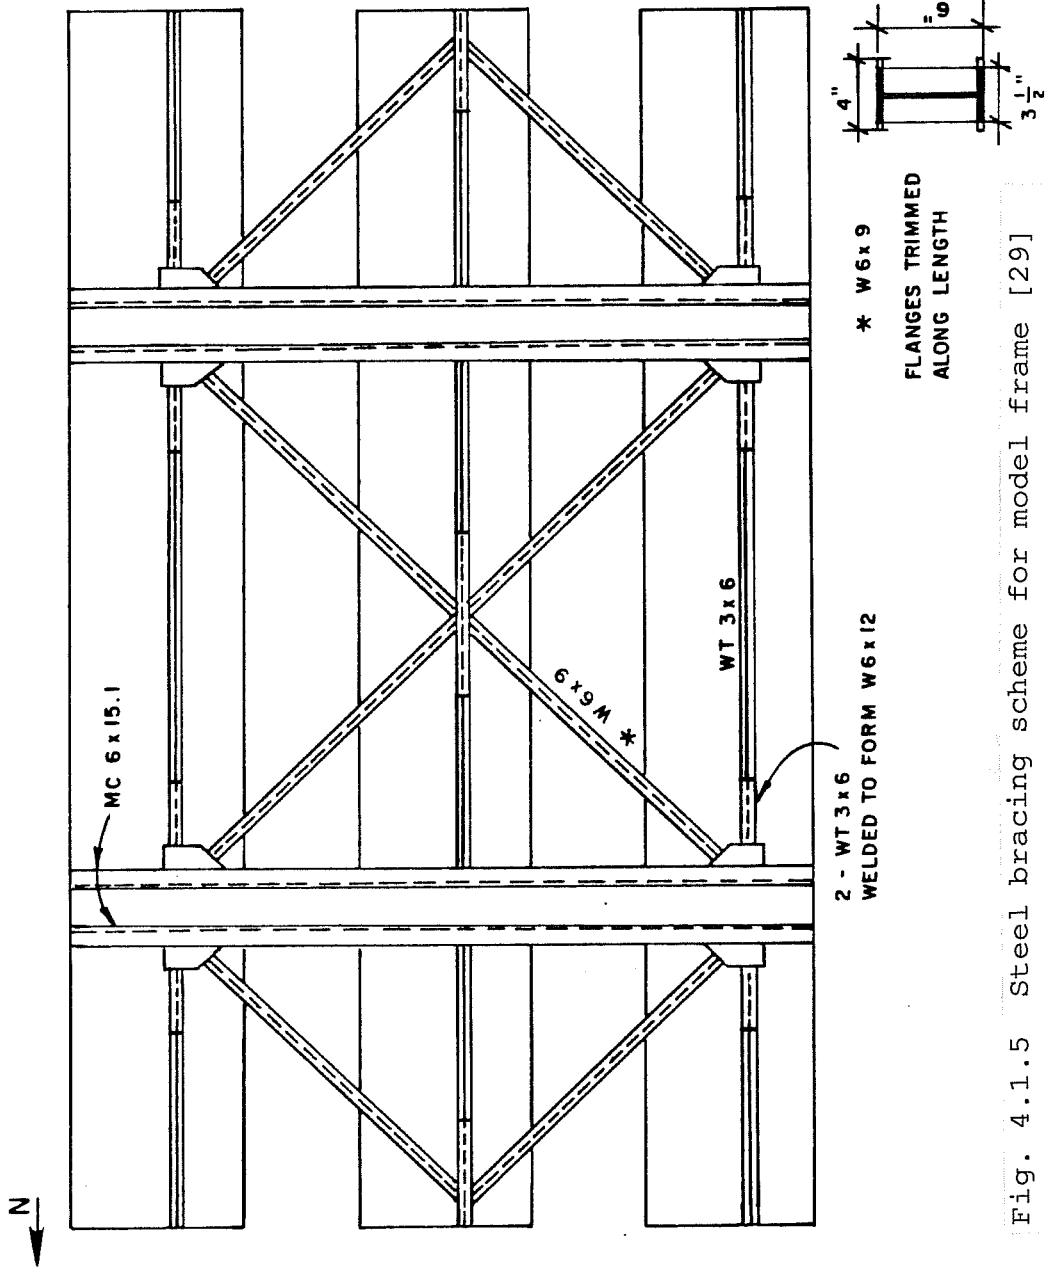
Steel bracing scheme for model frame [29]
